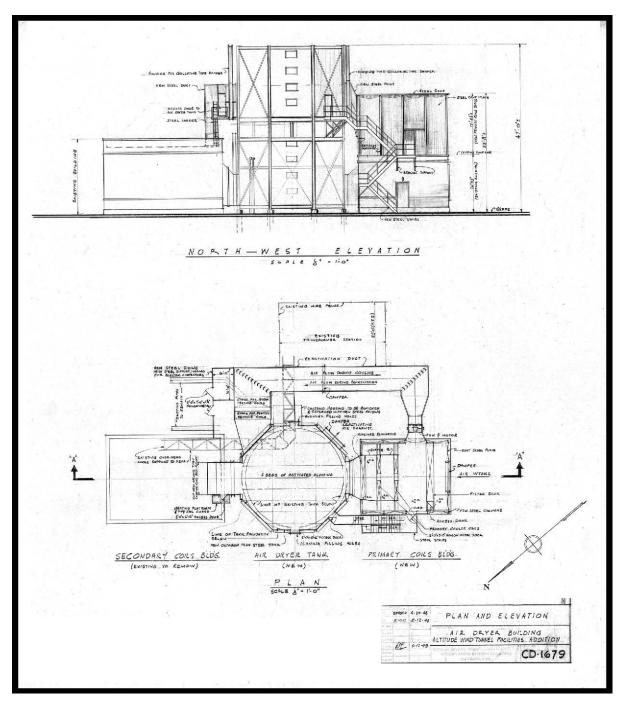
Plan and elevation drawing for the Air Dryer Building addition, 1948 (OH_Cuyahoga_AWT-Support_079).
